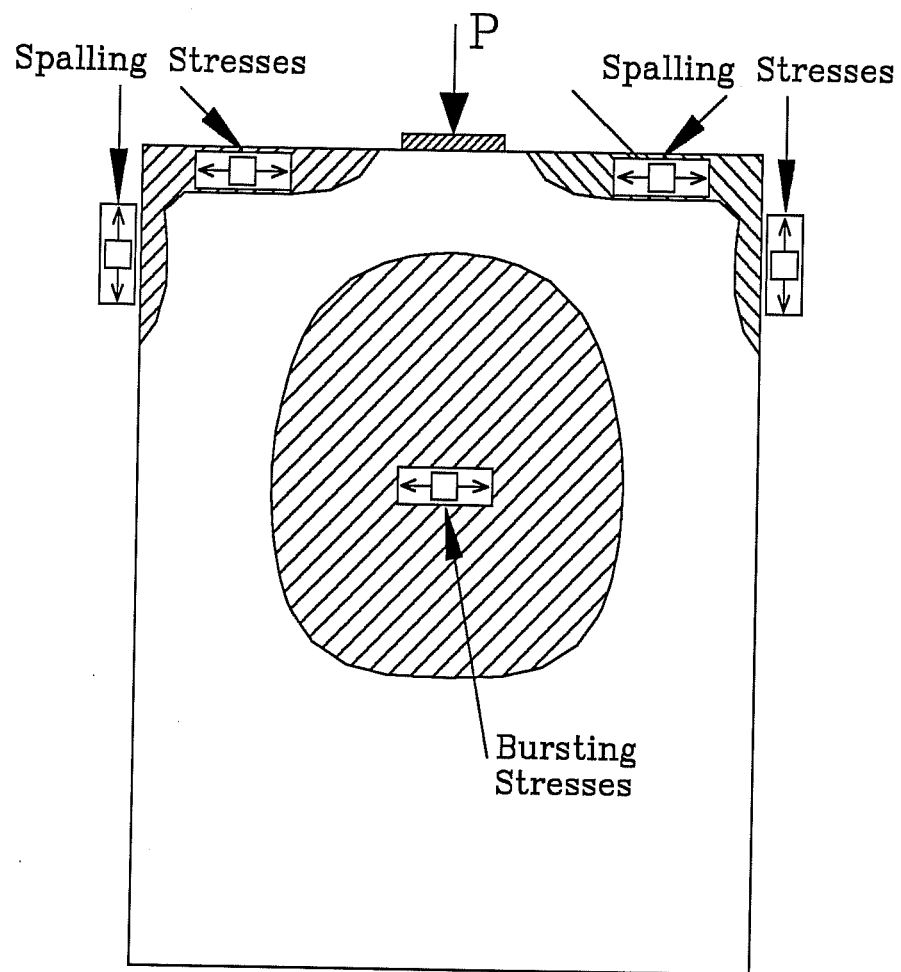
Areas of Bursting and Spalling Stresses in a Concentric Anchorage Zone
